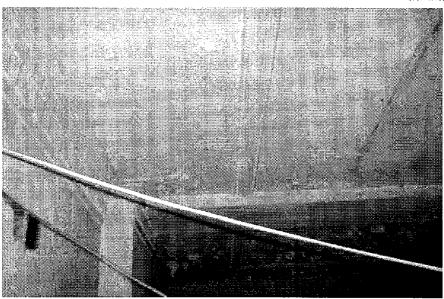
White paint with elevated levels of lead on the ceiling of the southern room of the commercial tenancy at 91 Liverpool Road.
